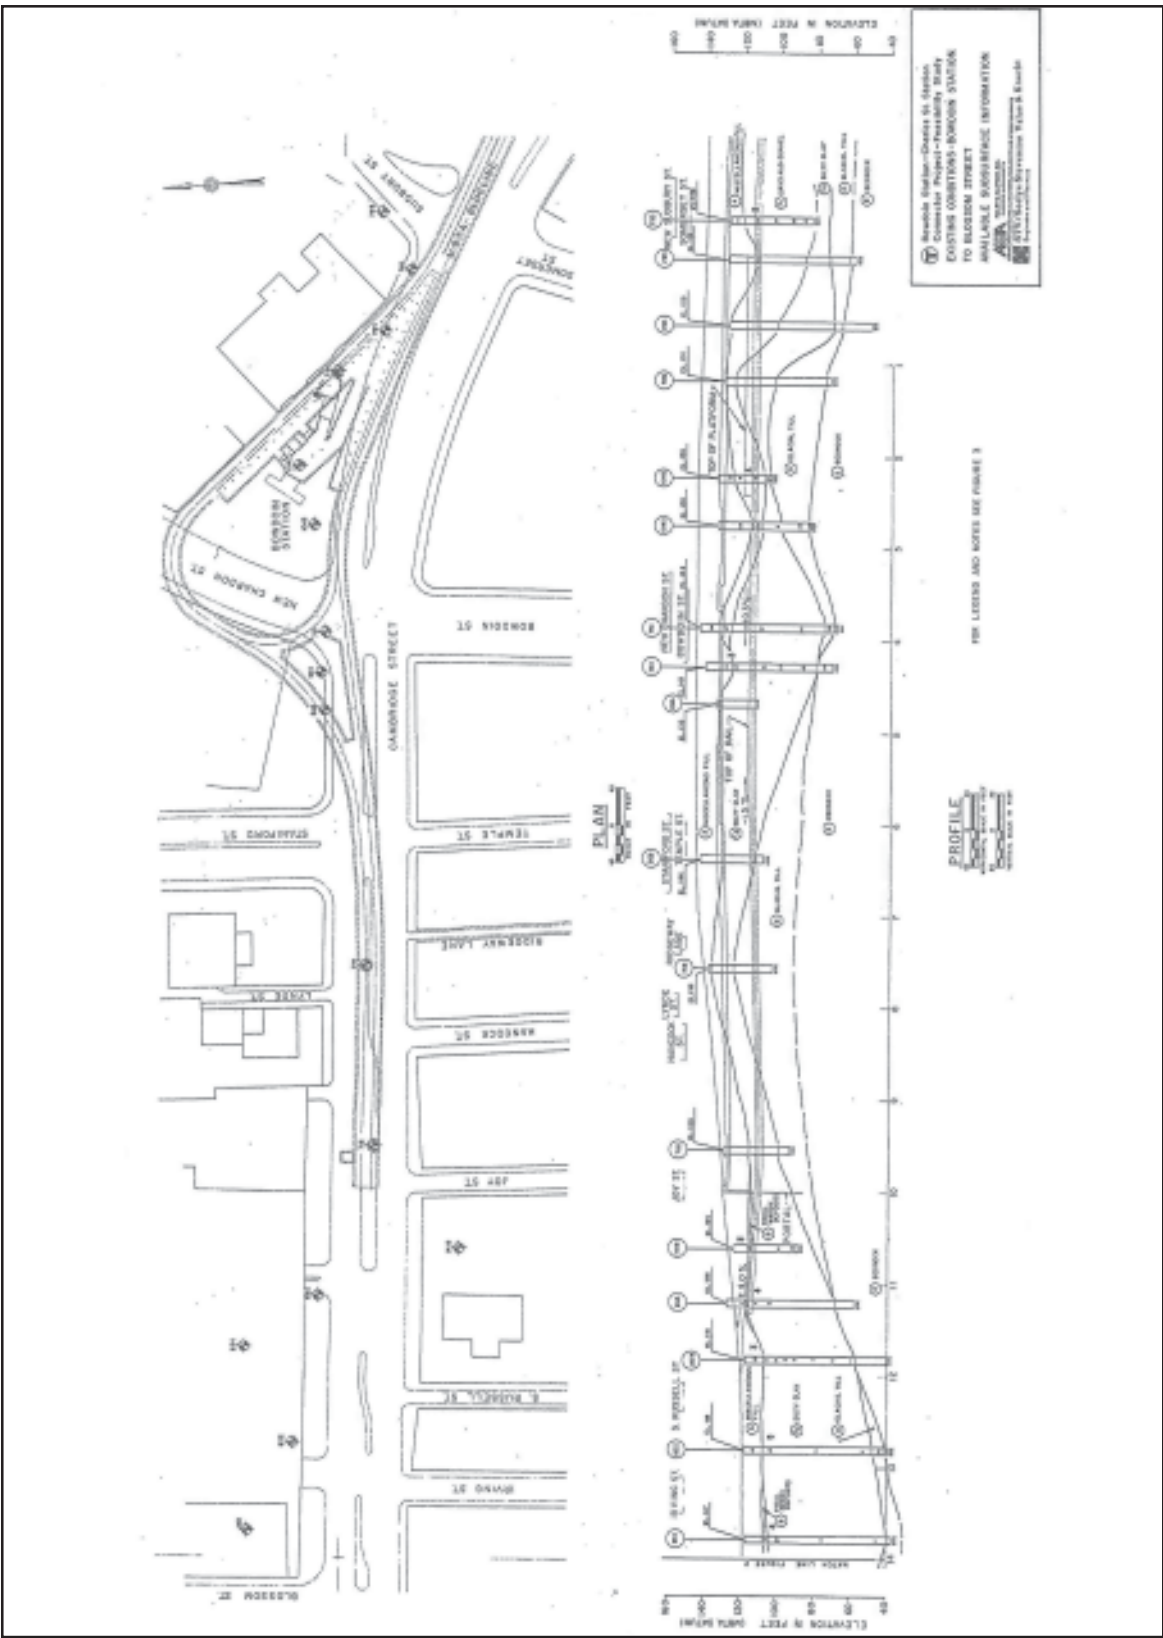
Existing conditions plan of the East Boston Tunnel Extension at Bowdoin Station and Cambridge Street. Not shown is the original incline in Cambridge Street between Joy and South Russell Streets. This structure was demolished in 1954 (source: Massachusetts Executive Office of Transportation 2007).
